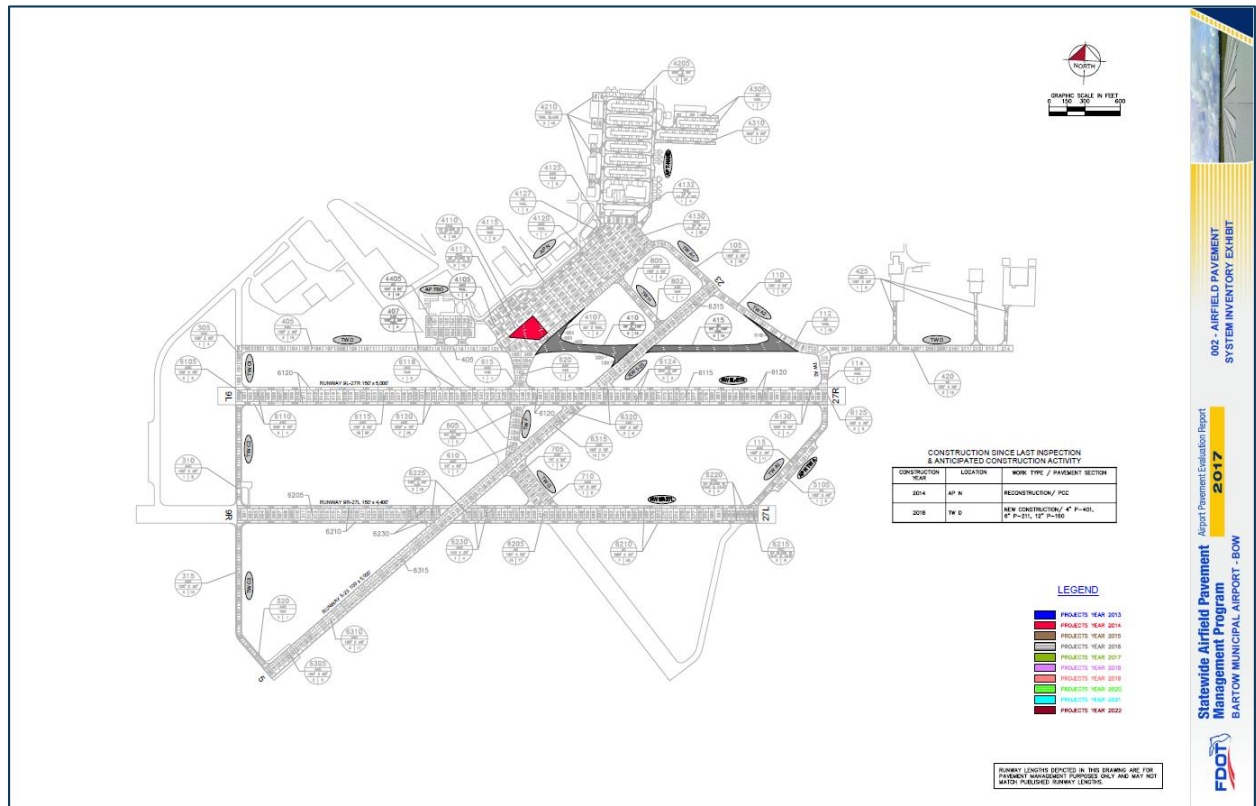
2017 Airfield Pavement Network Definition Exhibit
